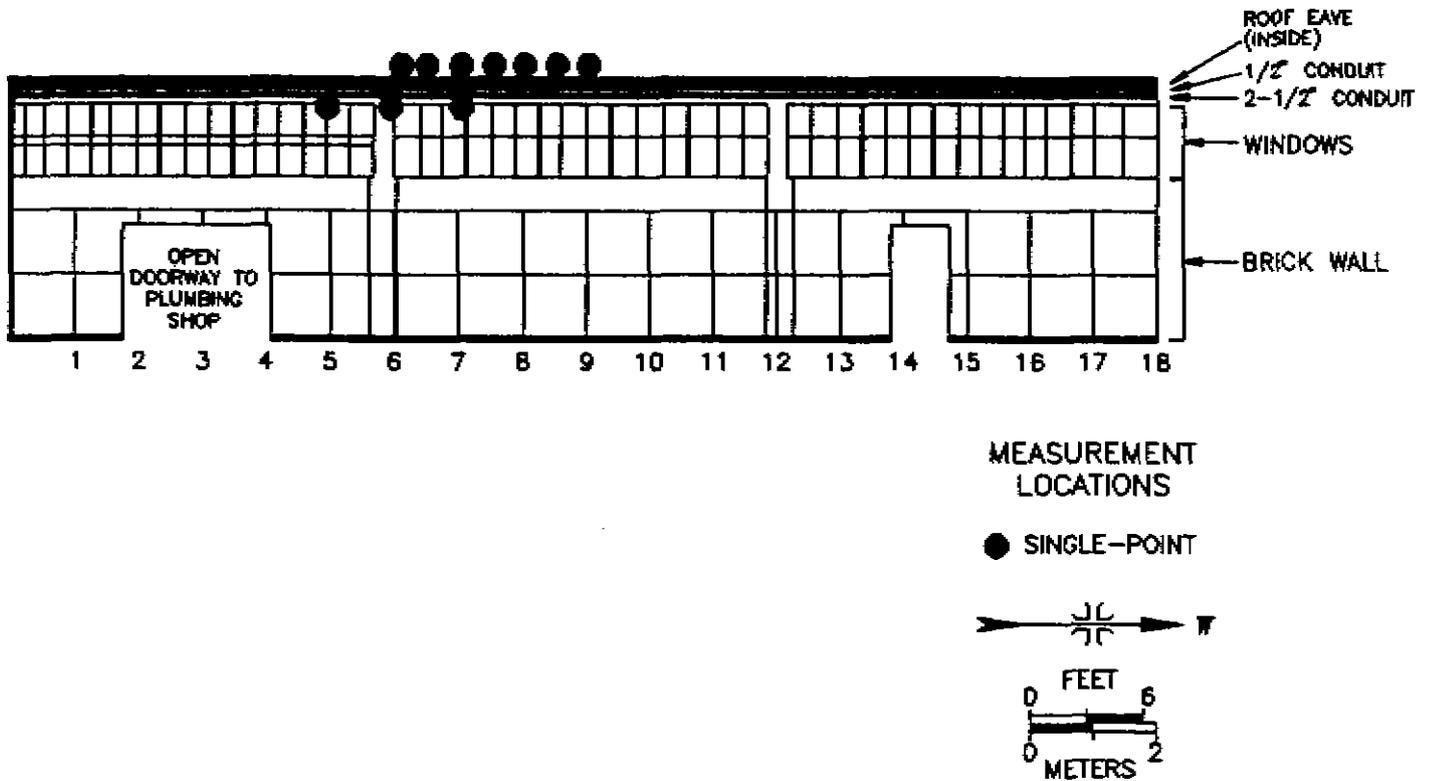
Building 5, Machine Shop, South Wall, Indicating Measurement Locations on Conduits and Roof Eave
